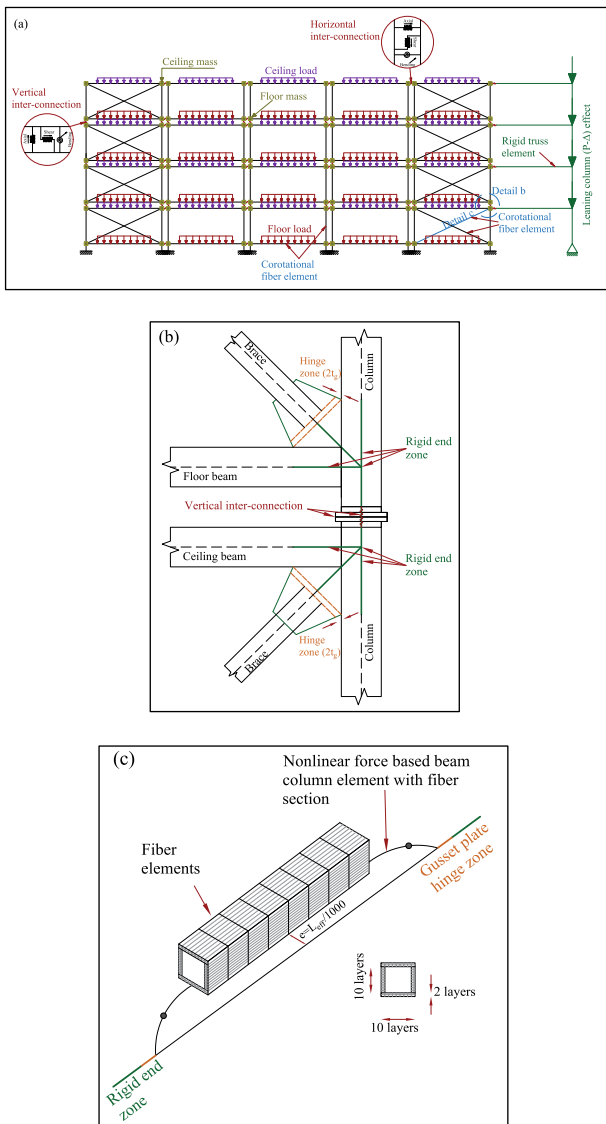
(a) Detail of the finite element model for the frames in OpenSees, (b) detail of gusset plate connection, (c) detail of brace modelling with gusset plate.
